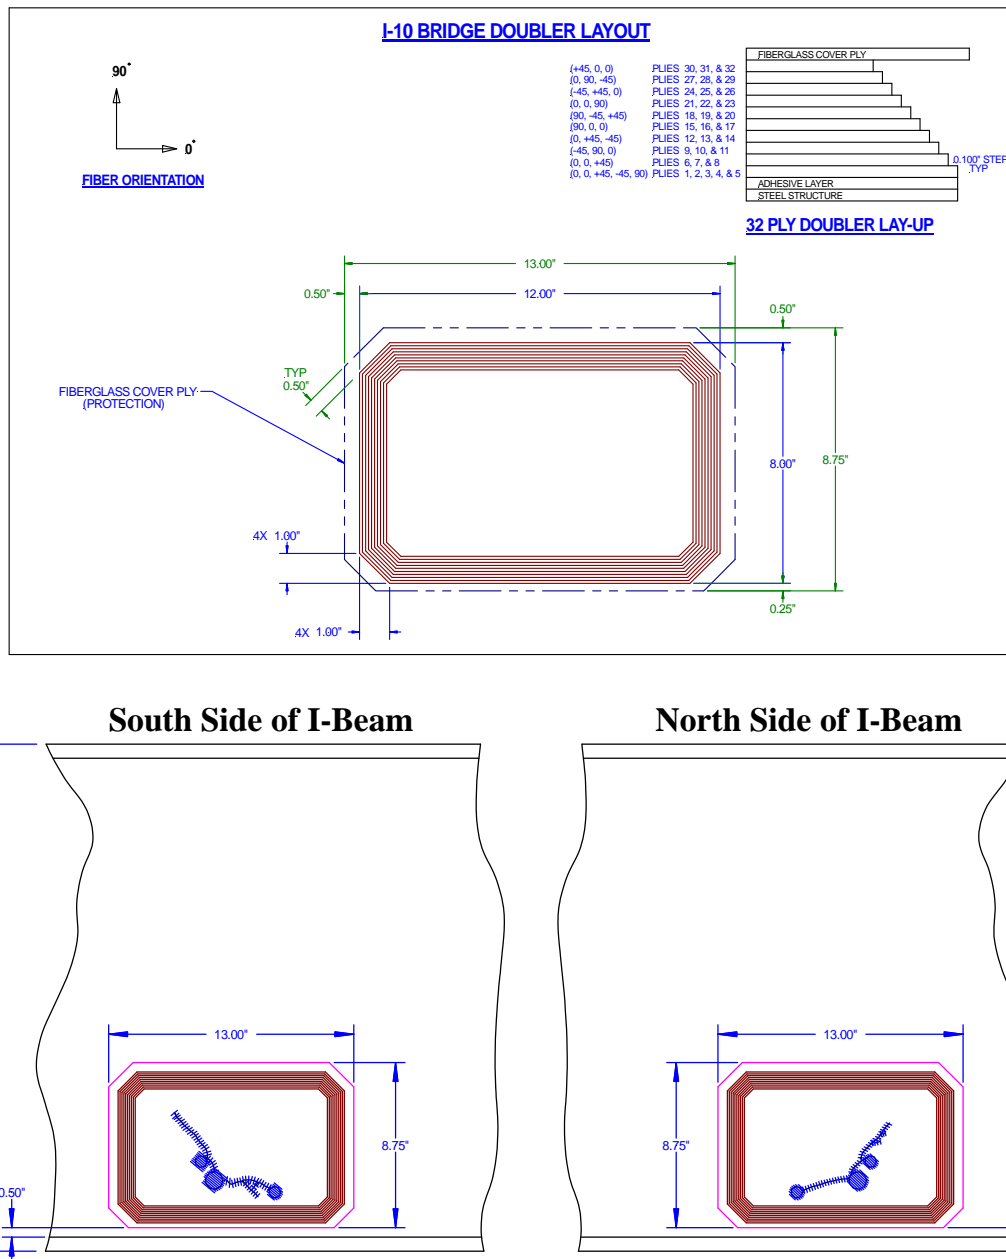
Final composite doubler repair design for bridge I-beam repair.
